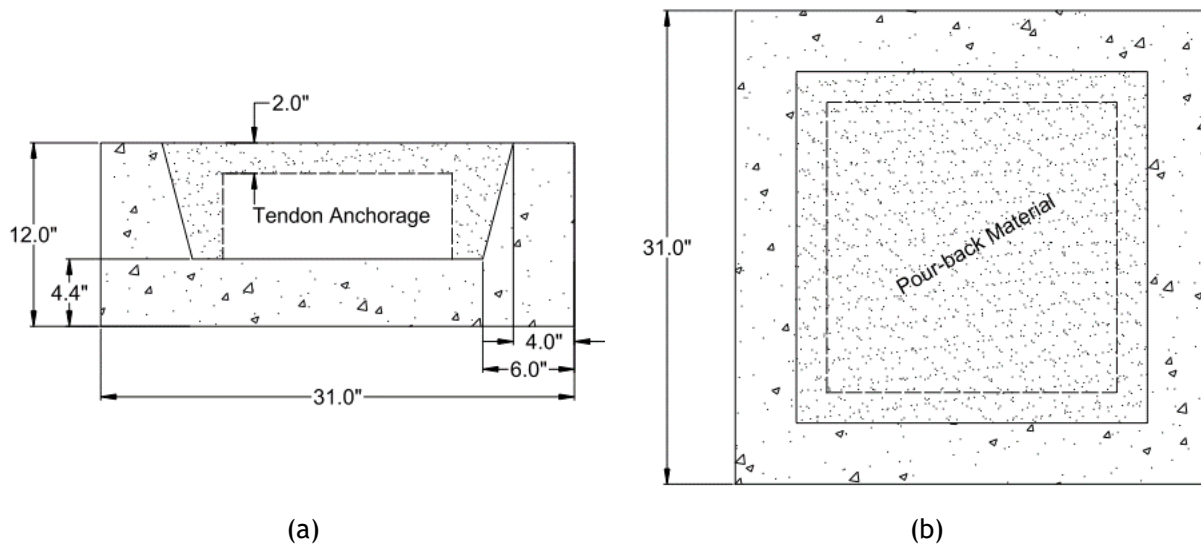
Anchorage Mock-up Plans: (a) front section view and (b) plan view
